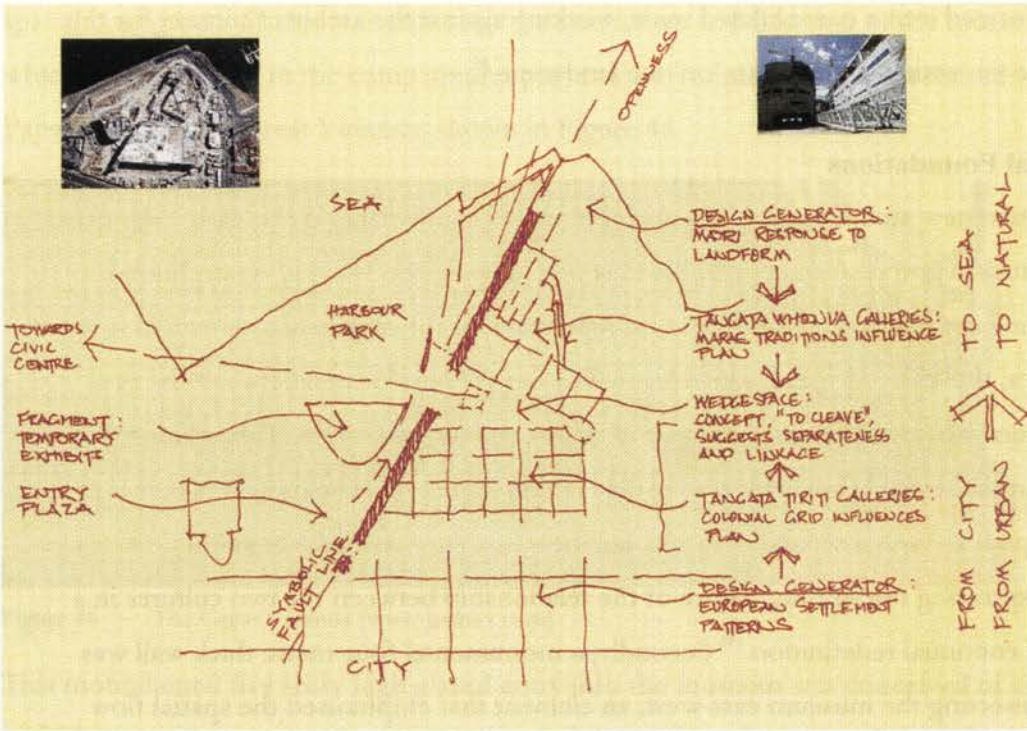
The Developed Concept (Pete Bossley Te Papa: an architectural adventure, Wellington: Te Papa Press)
